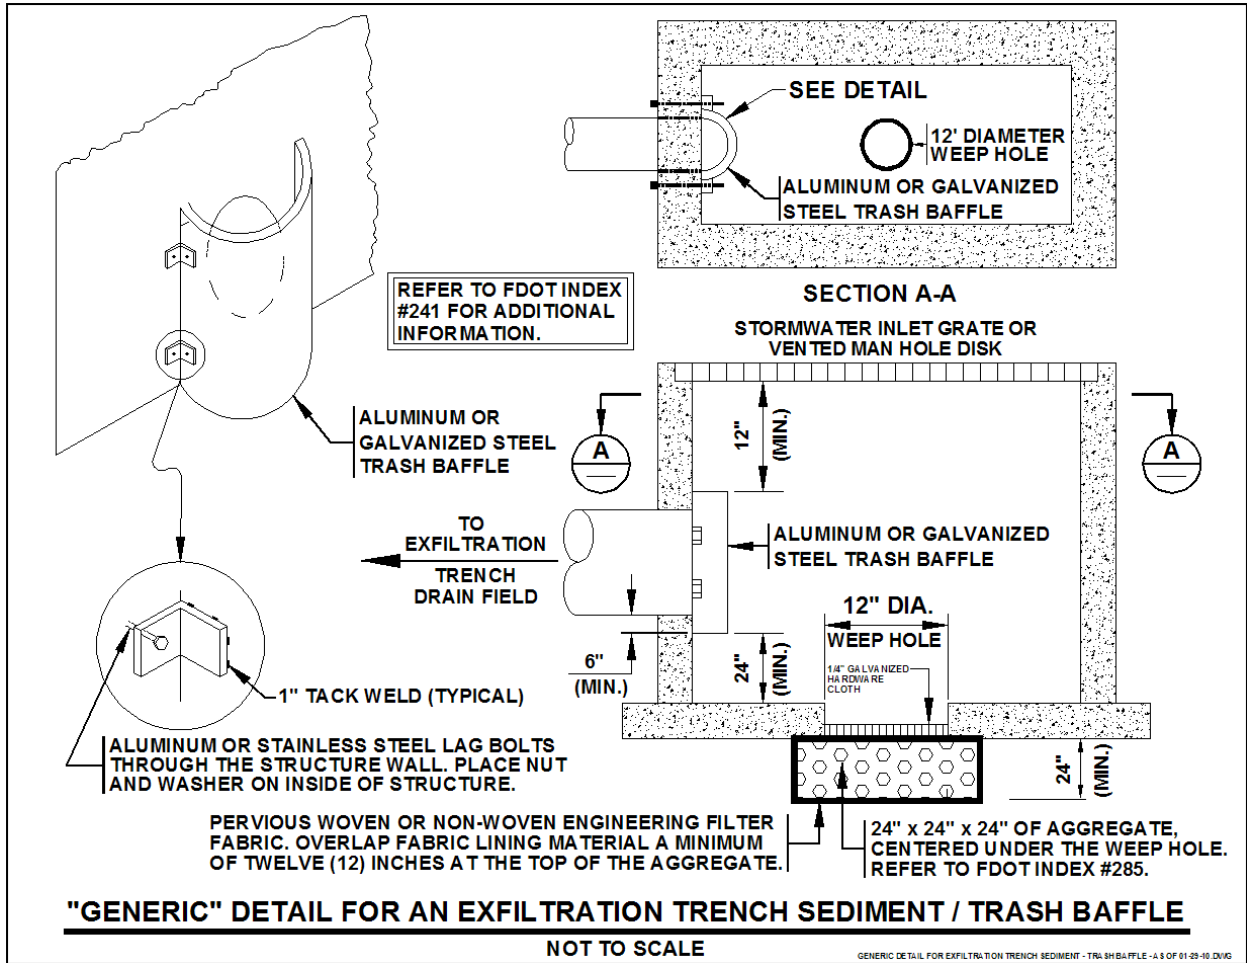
Detail for Exfiltration Trench Trash Baffle
